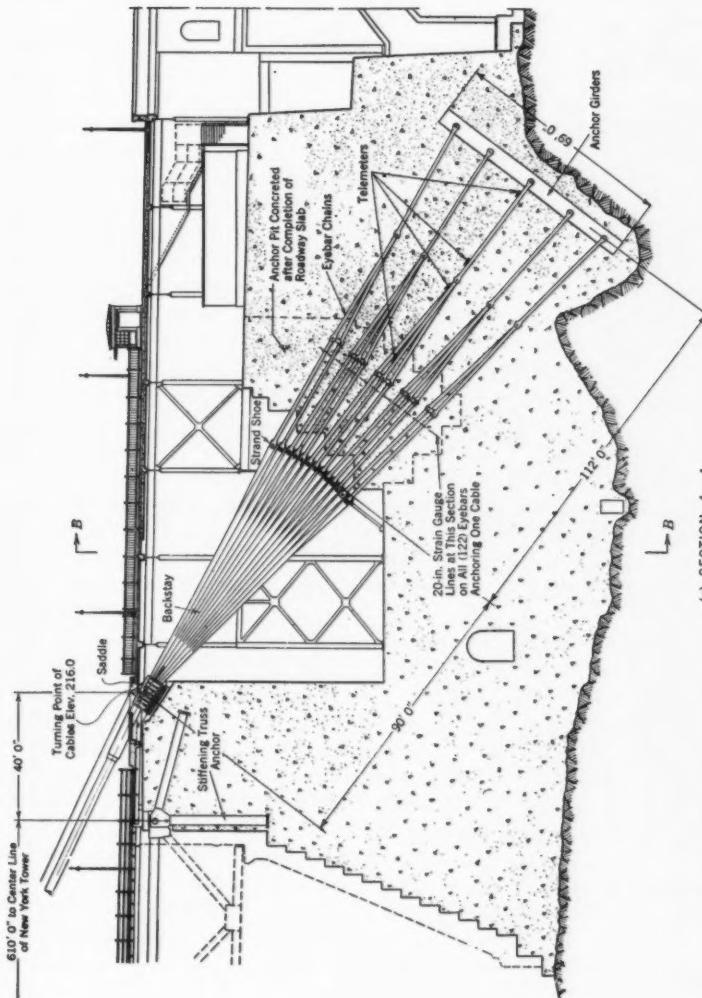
LONGITUDINAL SECTION A-A, NEW YORK ANCHORAGE (SEE, ALSO, FIGS. 4 AND 6).
